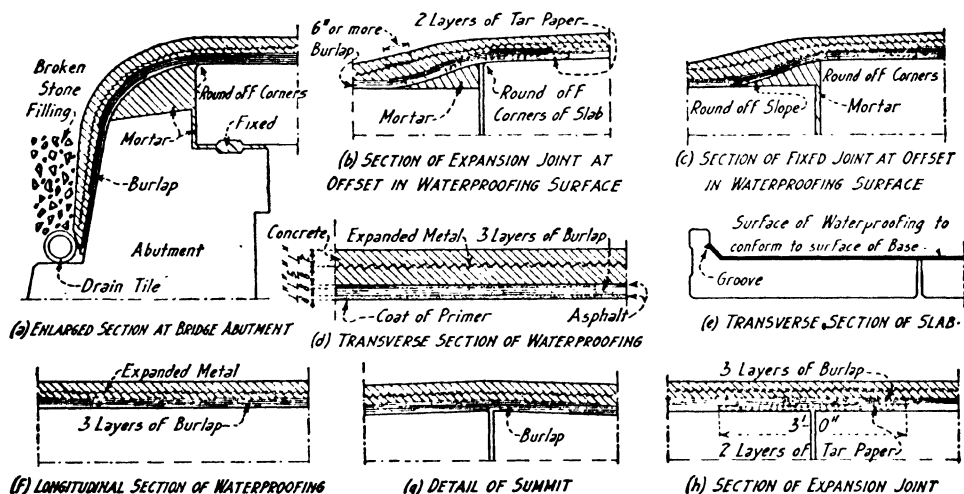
STANDARD METHOD OF WATERPROOFING BRIDGE FLOORS. C. M. & ST. P. RY.
